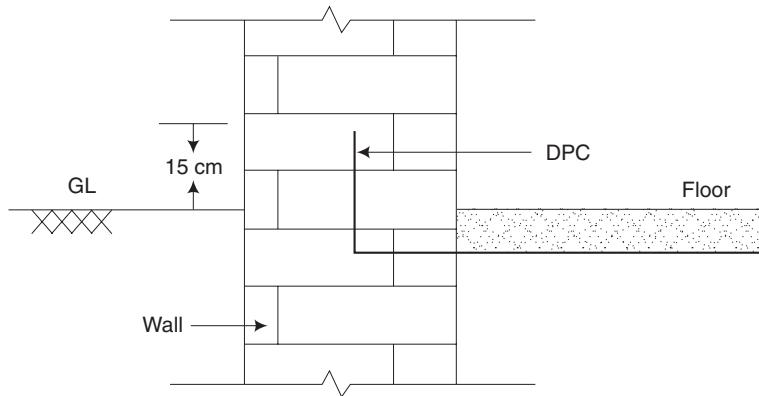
Damp-proofing for ground floor in level with ground surface
